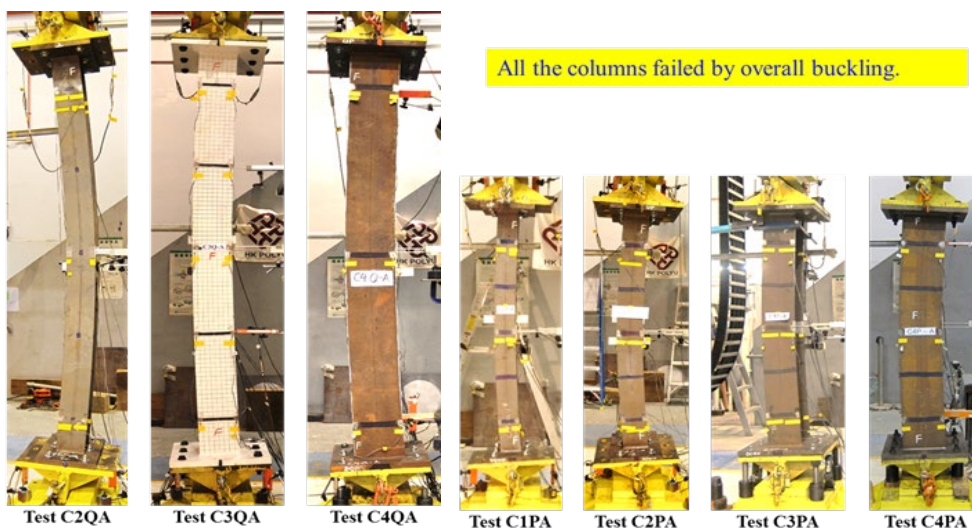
Slender columns of S690 welded H-sections under compression
